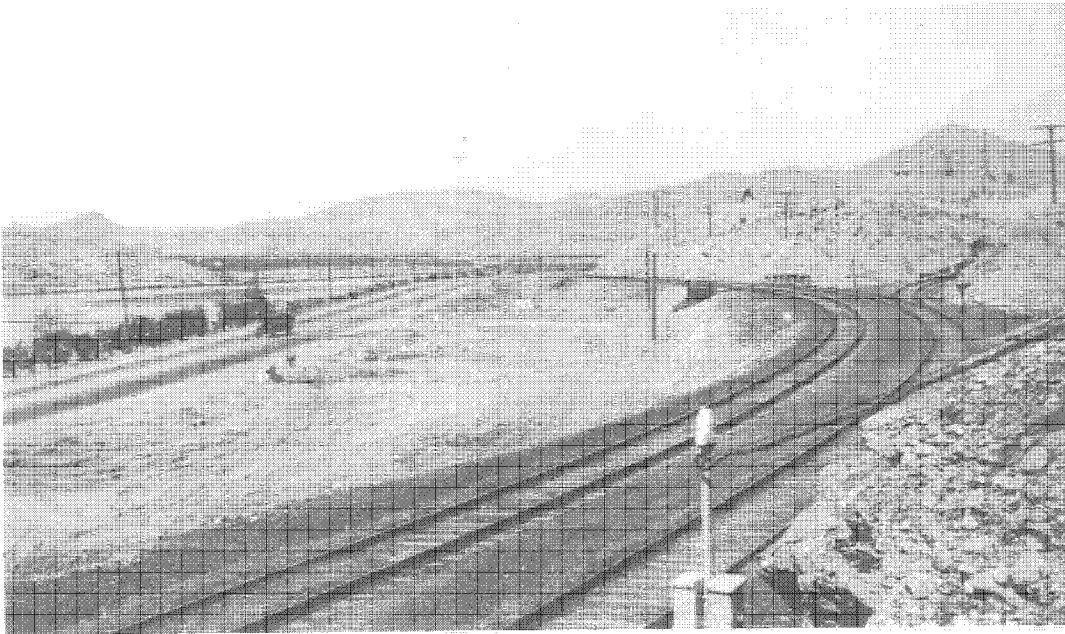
View prior to construction of the Smelter Bridge or American Canal, looking west, March 31, 1937.
